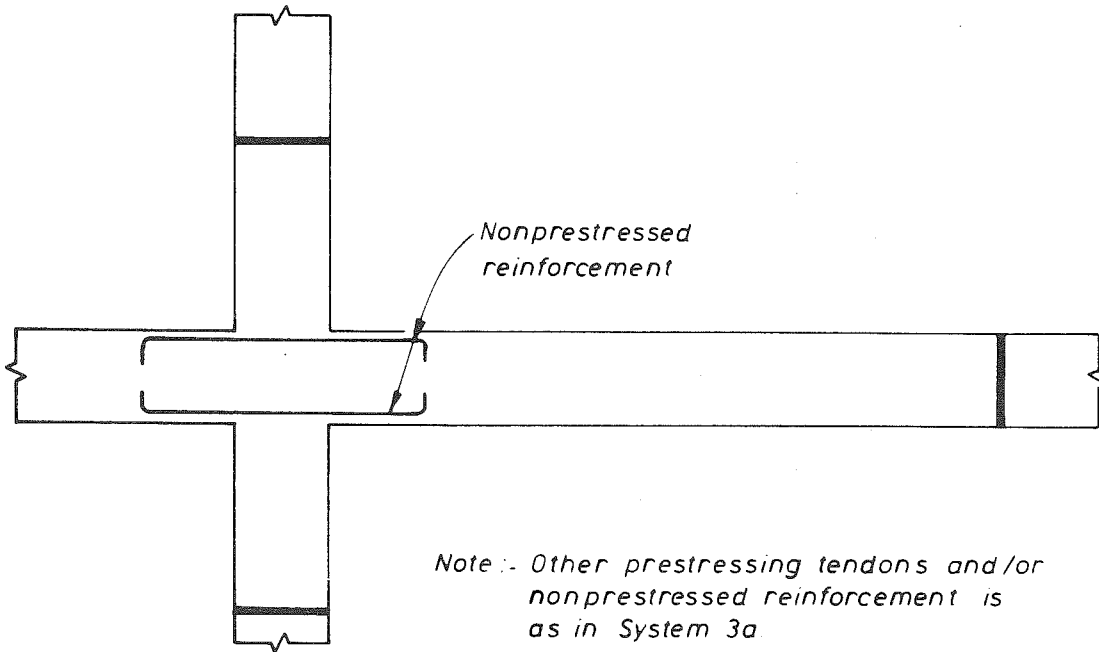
System 2 Configurations for Constructing Continuous Frames from Precast Concrete Elements.
